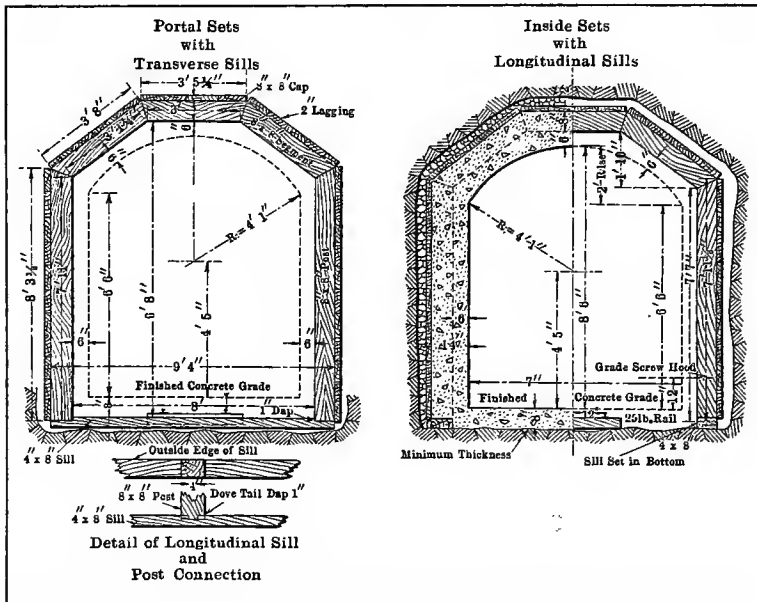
Concrete lined tunnel, Strawberry Valley Project, Utah.
